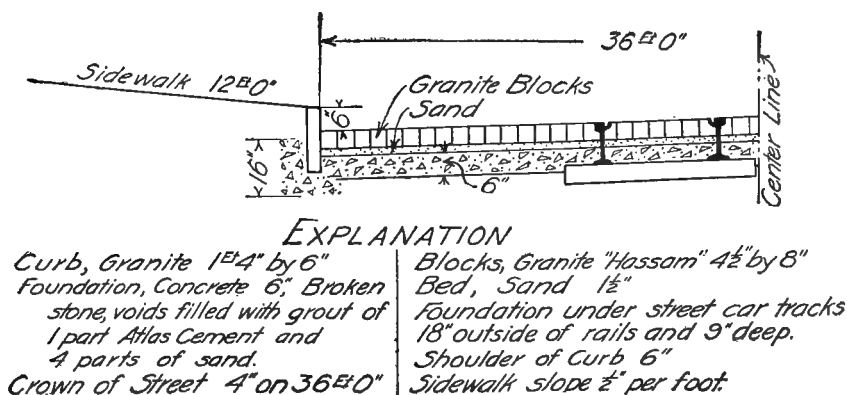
CROSS SECTION OF GRANITE BLOCK PAVEMENT ON RIVER STREET, TROY, N. Y.
